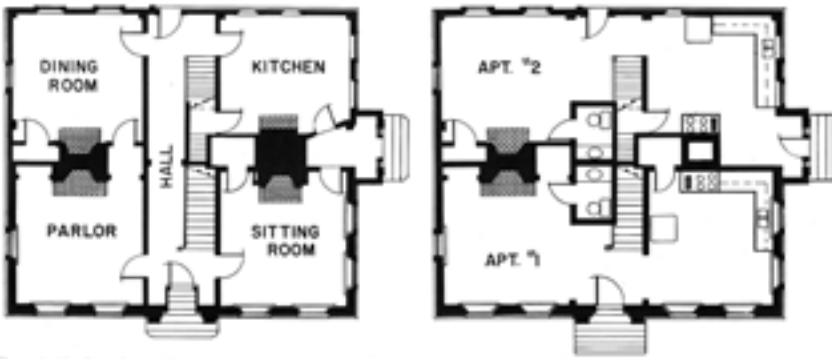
The floor plan at left is characteristic of many 19th century Greek Revival houses, with large rooms flanking a central hall. In the process of rehabilitation, the plan (at right) was drastically altered to accommodate two duplex apartments. The open stair was replaced with one that is enclosed, two fireplaces were eliminated, and Greek Revival trim around windows and doors was removed. The symmetry of the rooms themselves was destroyed with the insertion of bathrooms and kitchens. Few vestiges of the 19th century interior survived the rehabilitation. Drawing by Neal A. Vogel
